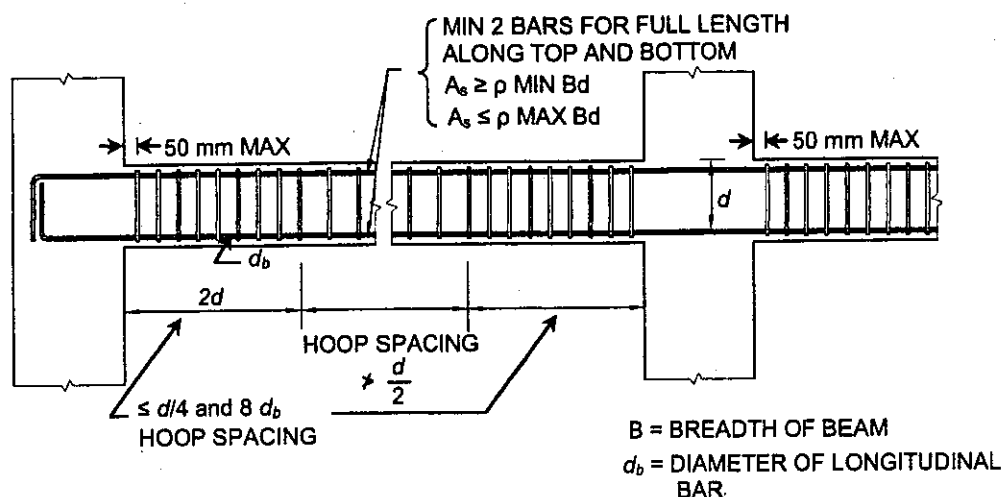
DETAILS OF TRANSVERSE REINFORCEMENT IN BEAMS
